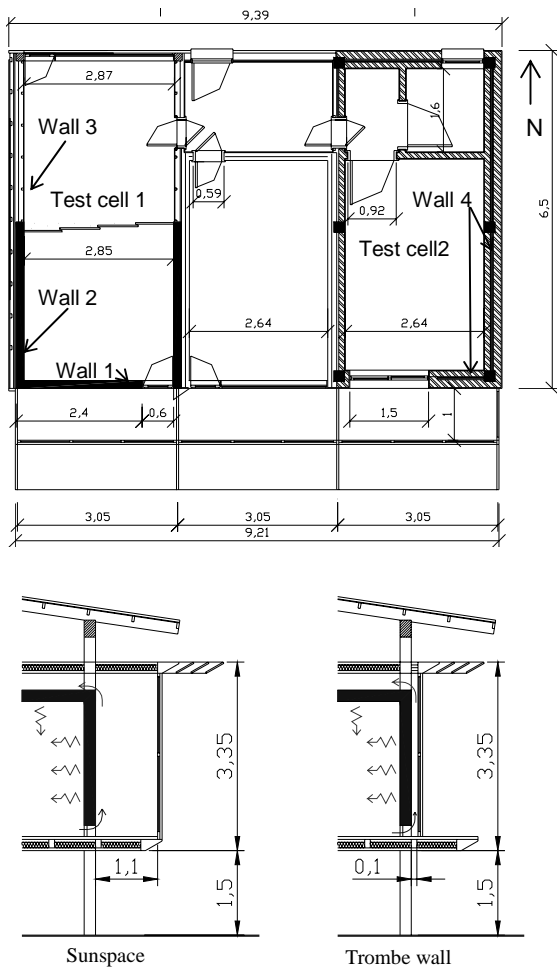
Test cells' plan and schematic vertical section of moving glazed frame (through wall 1) to create a Sunspace or a Trombe wall (distances in m).
